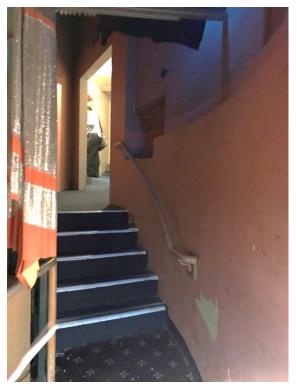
Steps and ramp up to the back of house area at the southeast portal, looking east.
